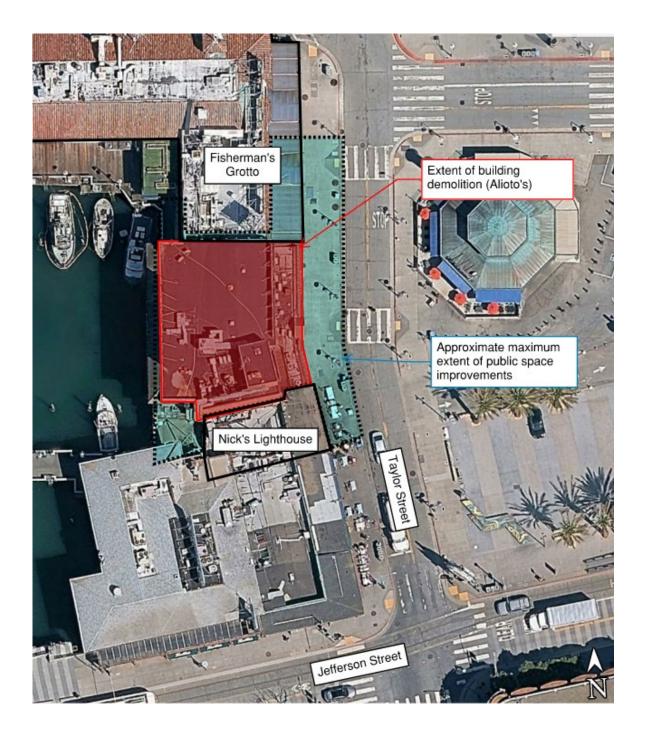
PROPOSED SITE PLAN - TAYLOR STREET
